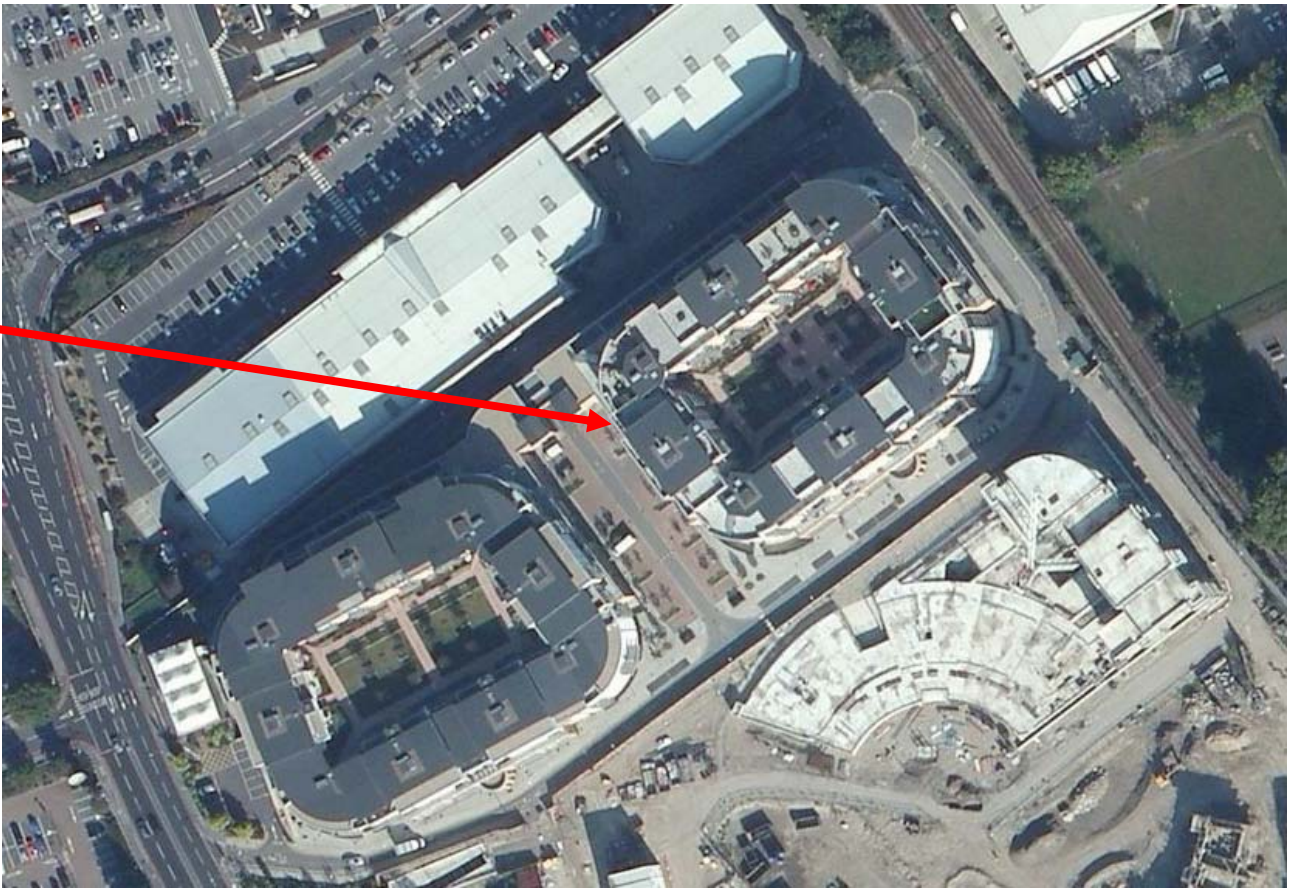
Aerial view highlighting the application site within the surrounding streetscene
